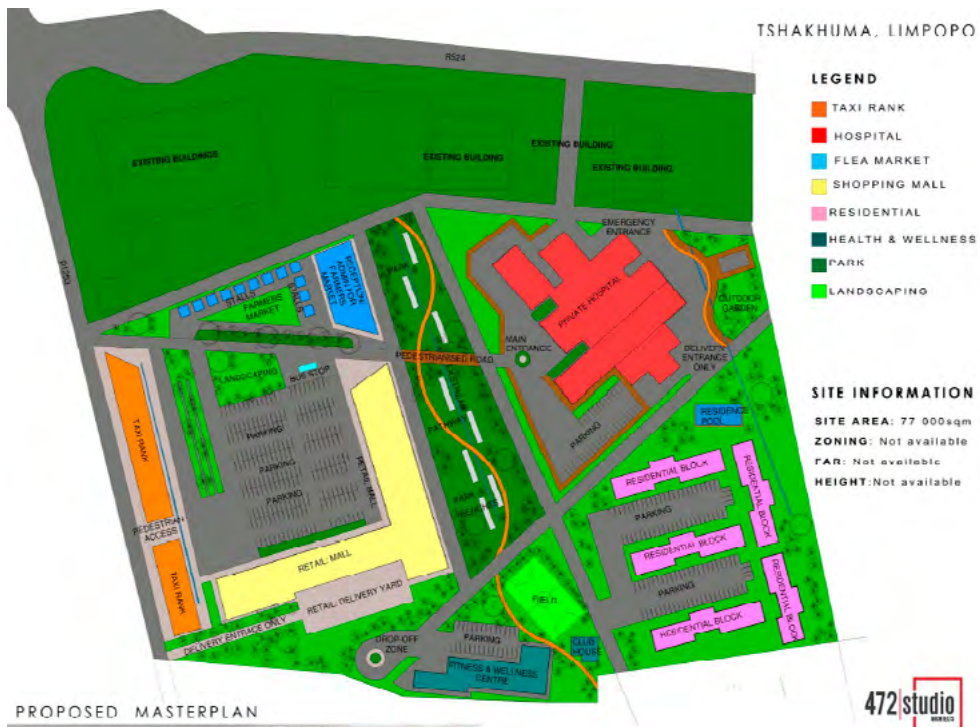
Proposed master plan, Tshakuma Mall, Limpopo Province
